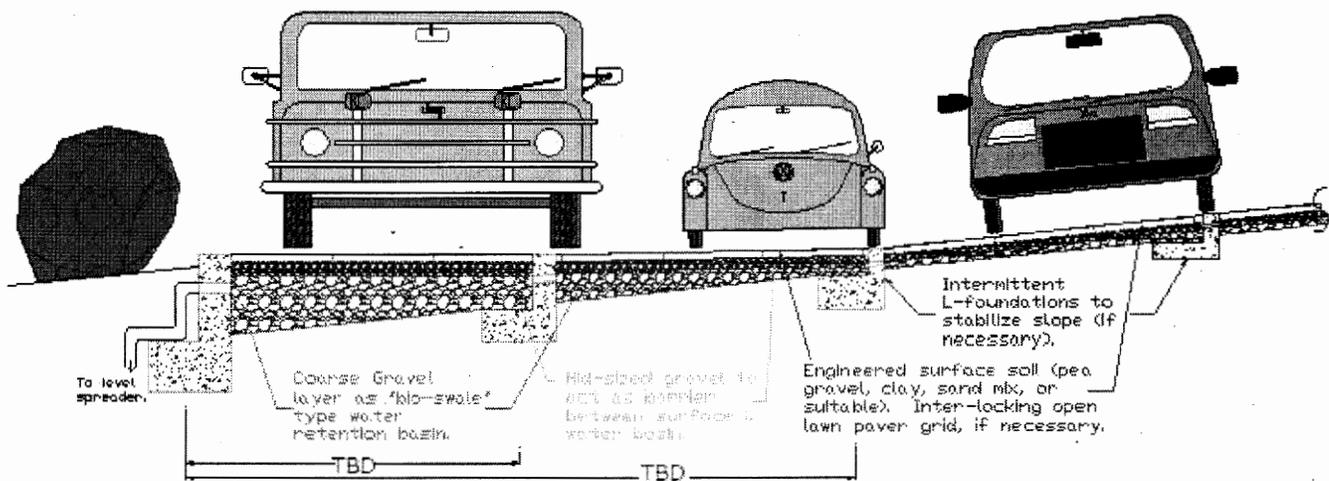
PARKING LOT CONCEPTUAL ‘FILL-TO-CAP’ CROSS-SECTION DESIGN
